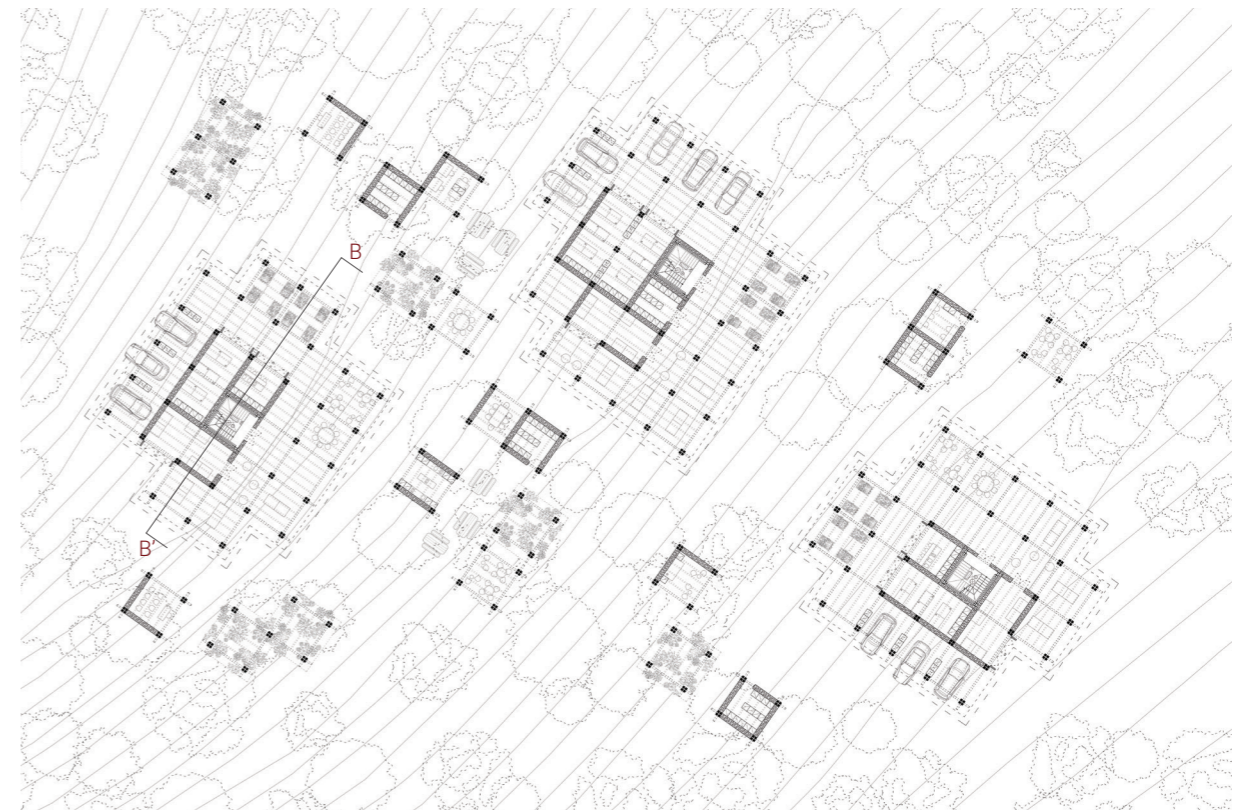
Ground floor and Second floor plans of a post-conflict phase cluster.
